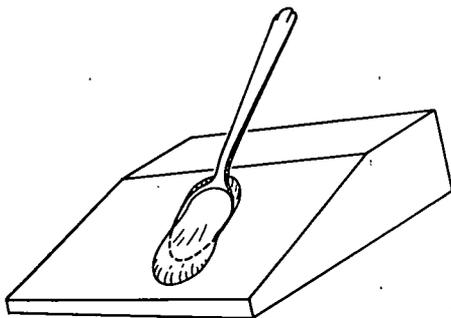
Spoon-shaped slope failure. Slope failures are often spoon-shaped, as in this sketch, or cylindrical as shown in Figure 9.
